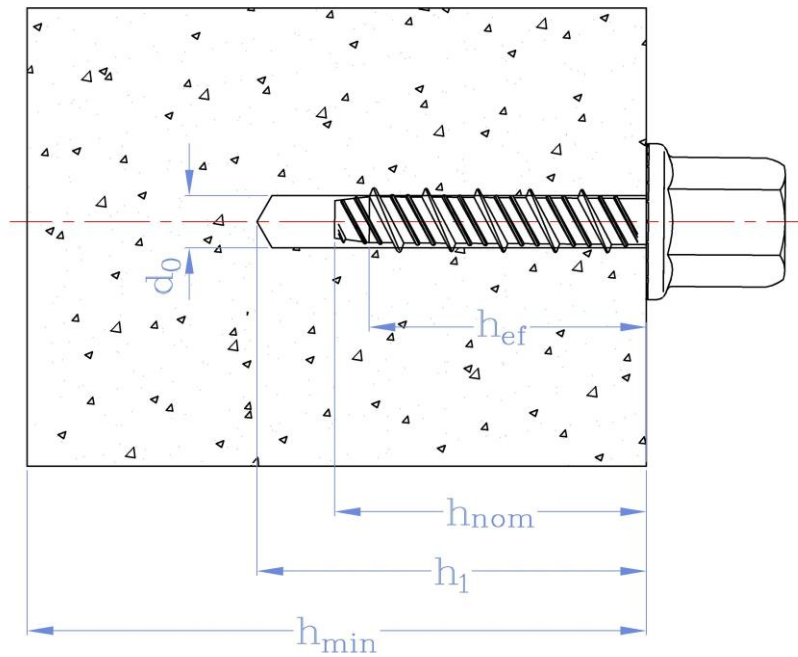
Installed condition for anchors SSW, SSR, SSP, SSK, SSH, SSX, SST and SSN.
